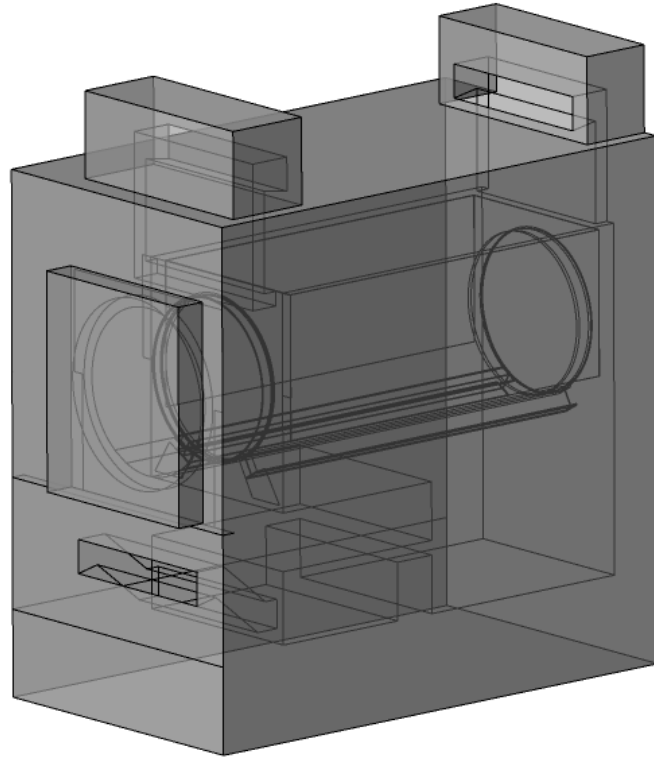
Three-dimensional schematic view of the HSM-1 module
